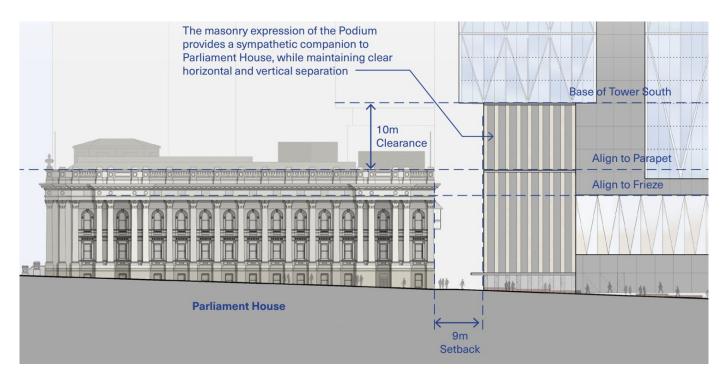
East Elevation & Setback to Parliament House (Source: JPW)
